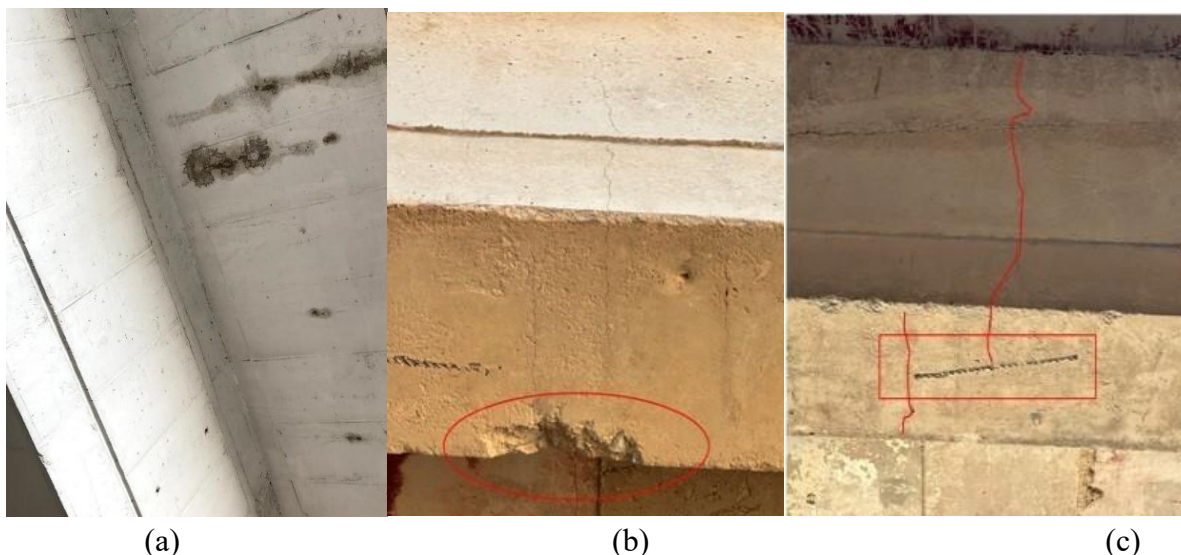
Photos taken during inspection. (a) corrosion steel bar (b) spalling, and (c) cracks and exposed rebar
